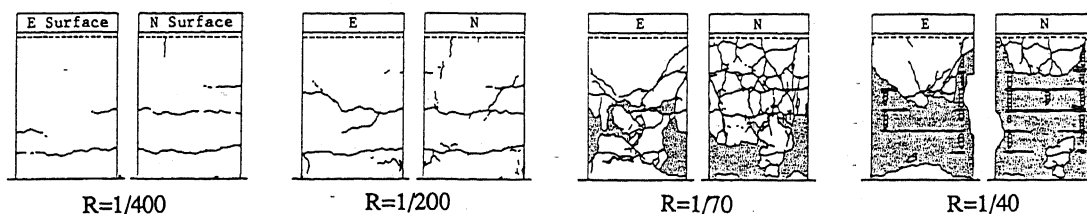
Crack pattern and spalling of specimen BC-6 at end of loading steps
